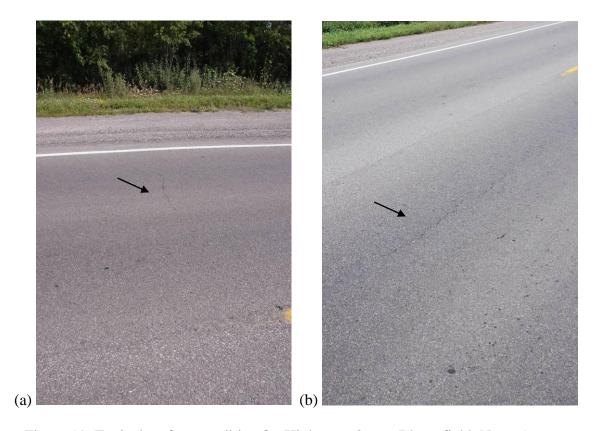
Typical surface condition for Highway 62 near Bloomfield. <u>Note</u>: Arrows indicate the presence of minor wheel path cracks.
